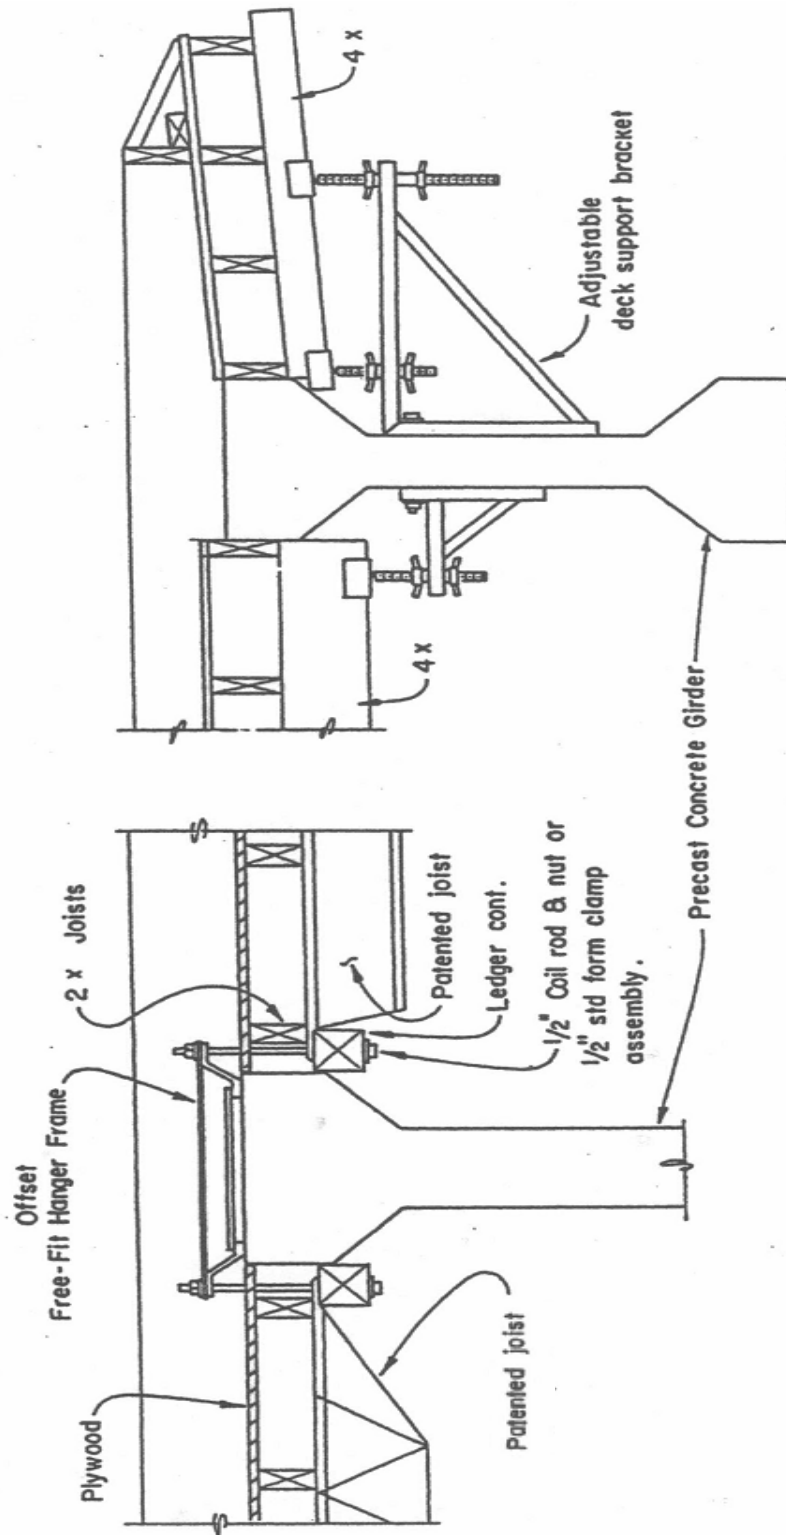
Sample Precast Concrete Girder Deck and Overhang Falsework Details.
